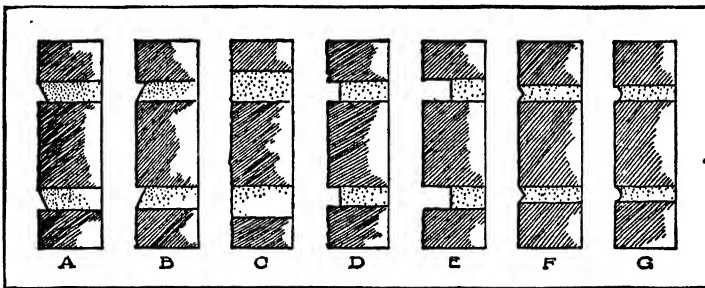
Common types of joints: (A) struck, (B) weathered, (C) flush or plain, (D) raked, (E) stripped (F) "V," (G) concave.
